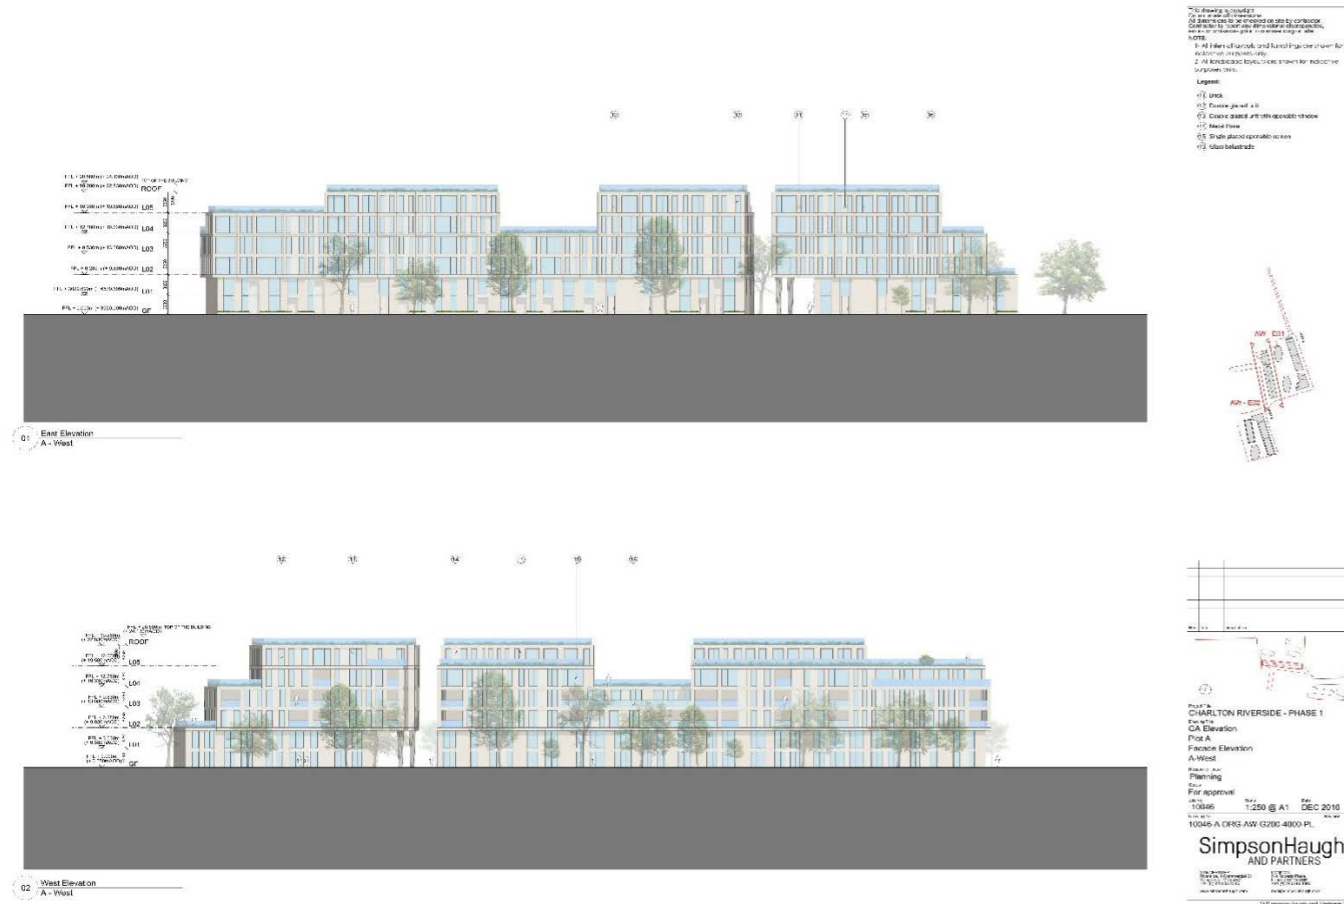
Plot A, Building AW Proposed Façade Treatment
